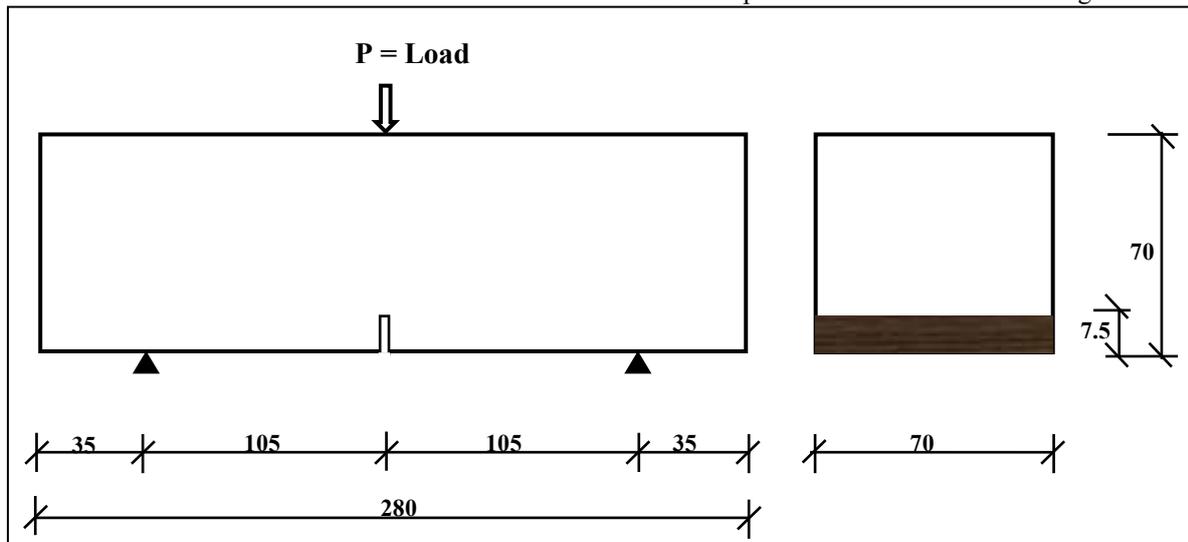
Three-point bending test of notched beam (all dimensions in mm)
